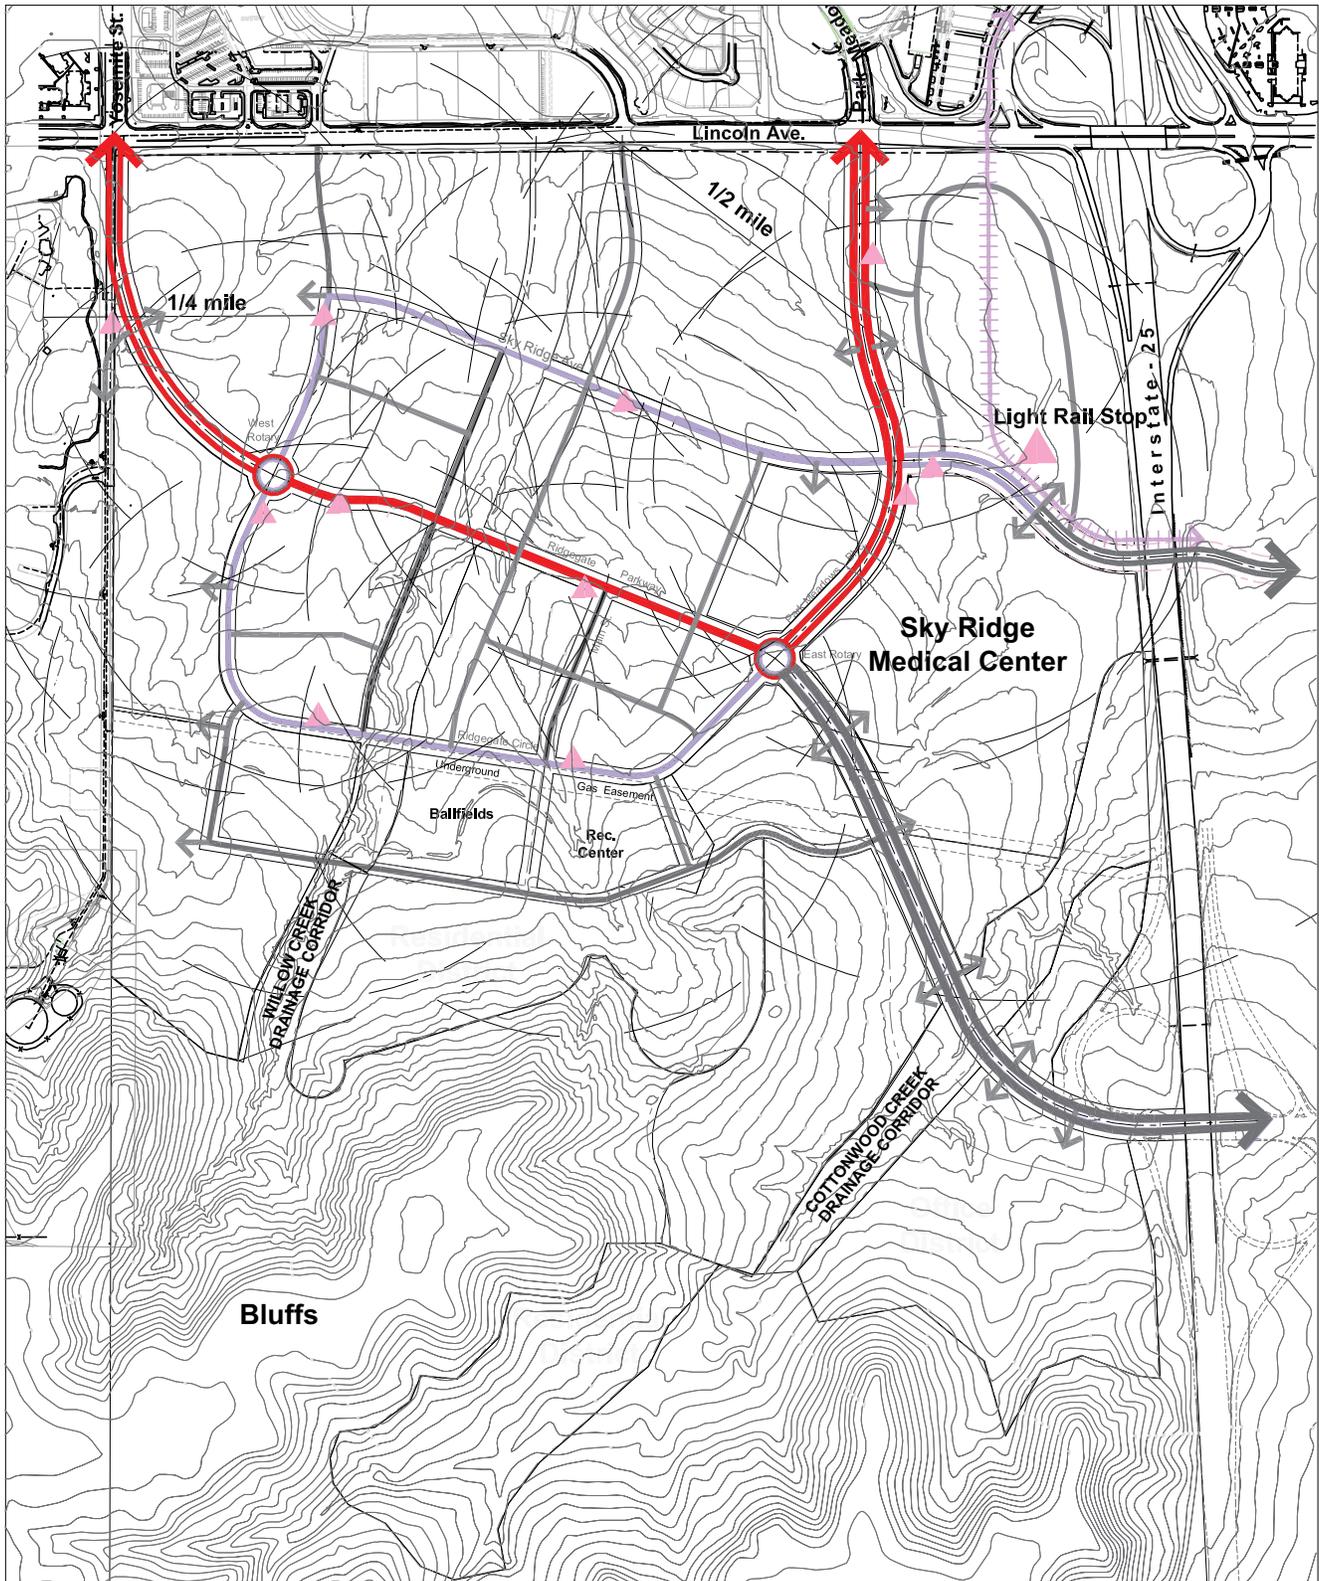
Section 15 Public Transportation Framework Plan
